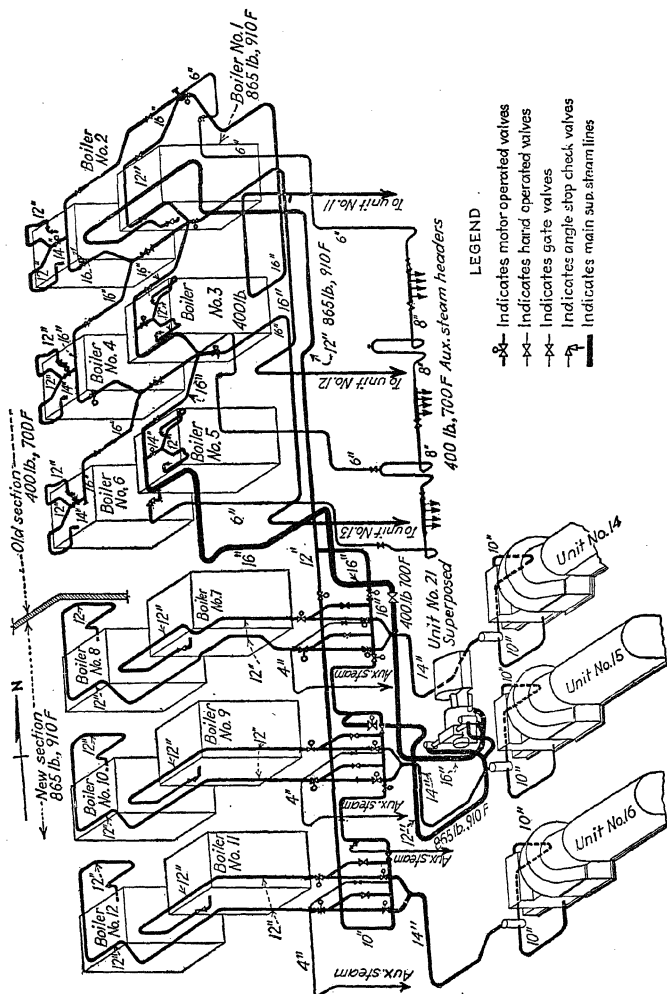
Main steam piping in old and new sections of Delray power plant.
